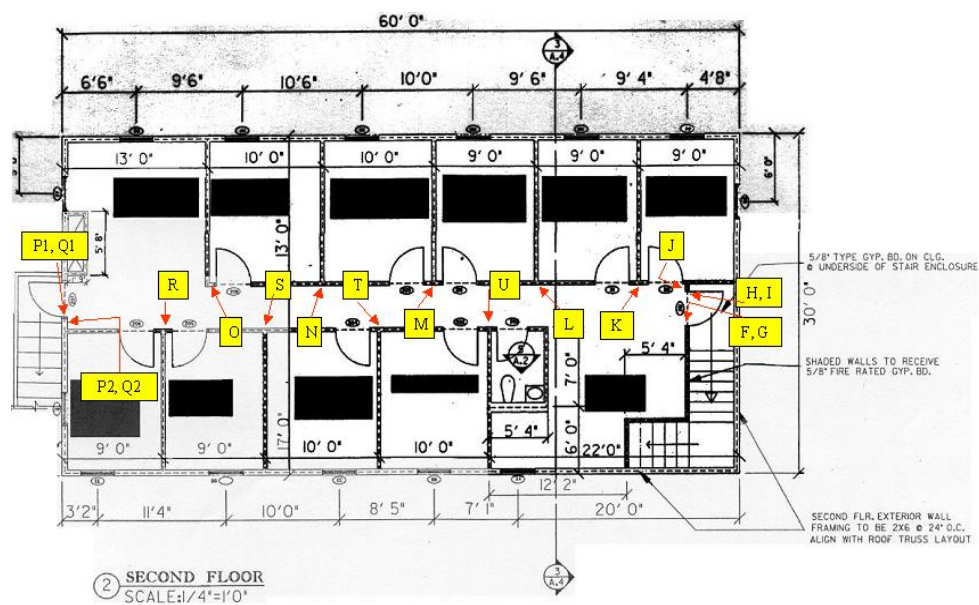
Second Floor Plan – Excitation Locations F through U for Hammer Impacts
